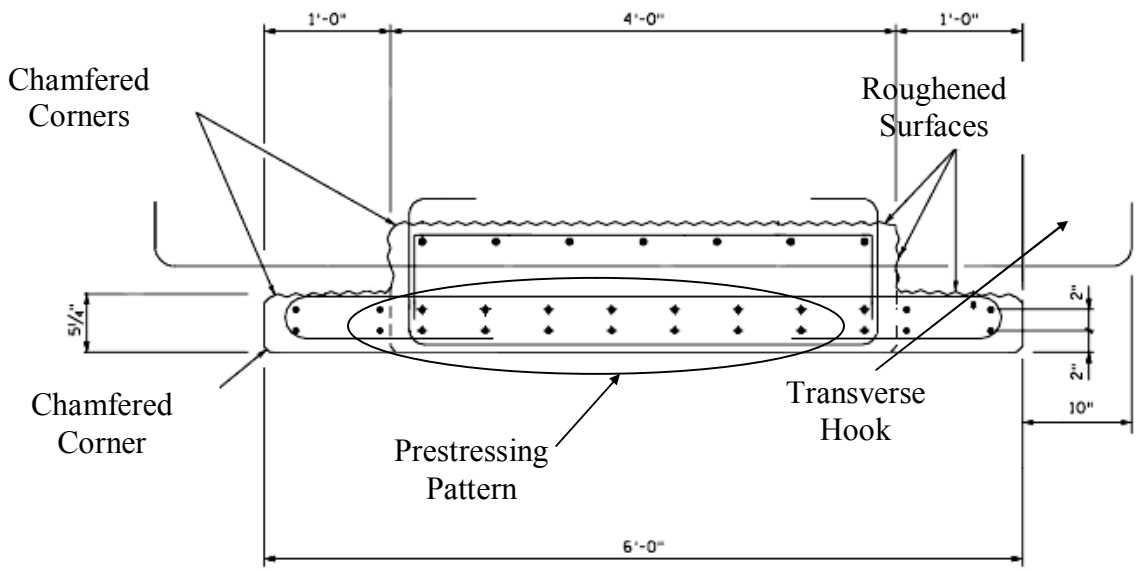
Cross-sectional view of interior inverted-T precast section concept
